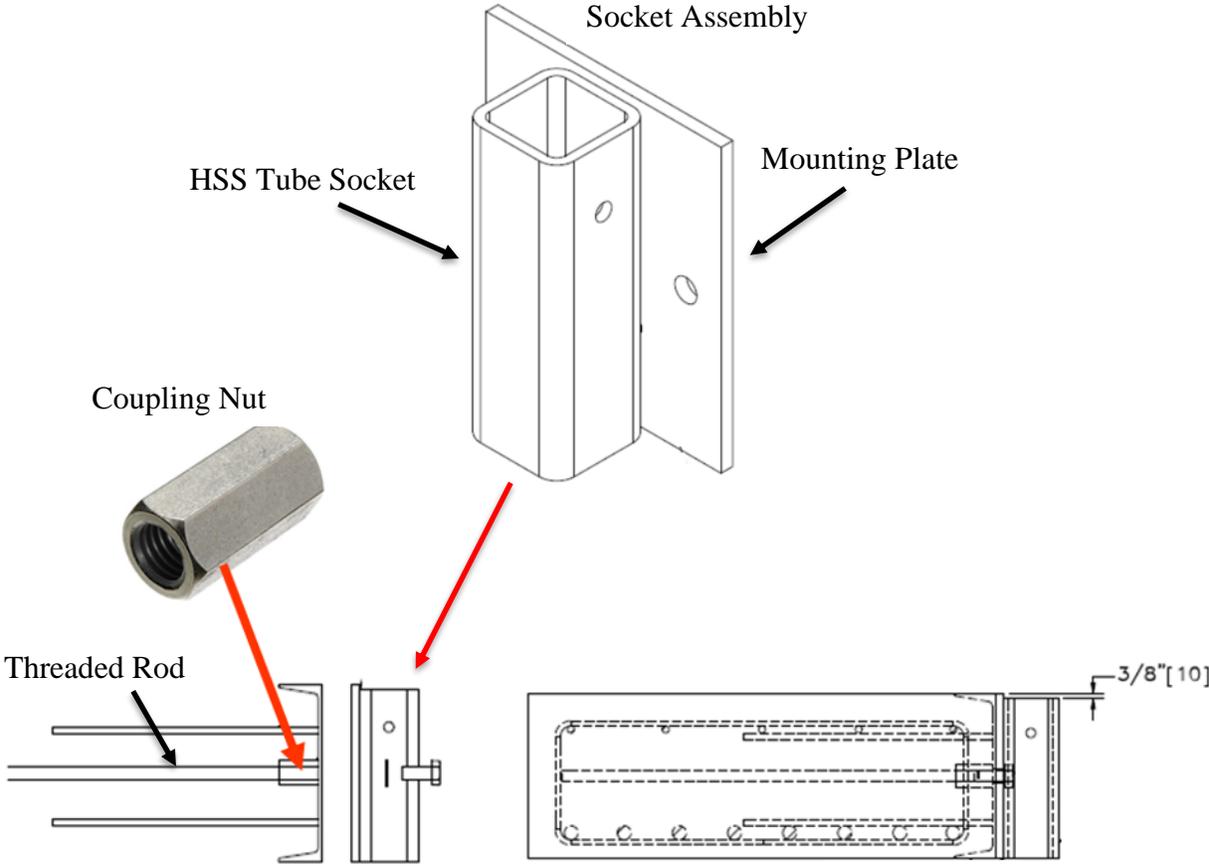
Coupling Nut and Threaded Rod Attachment of Socket Assembly to Deck
